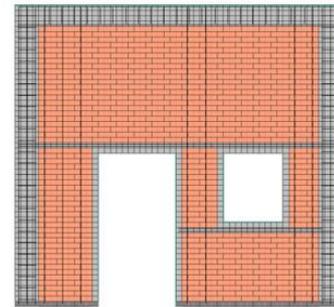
Case 4 - Vertical and Horizontal reinforcement
